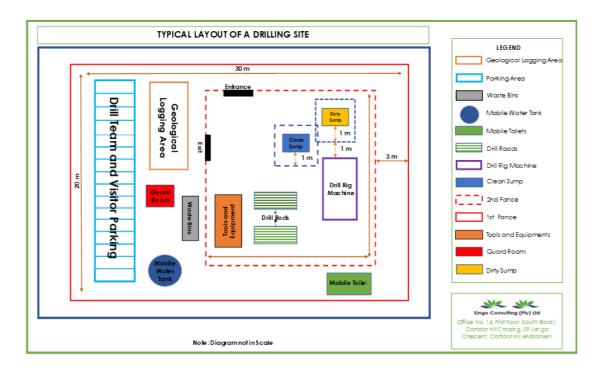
The drill site layout plan showing areas where specific activities will take place in the project area.
